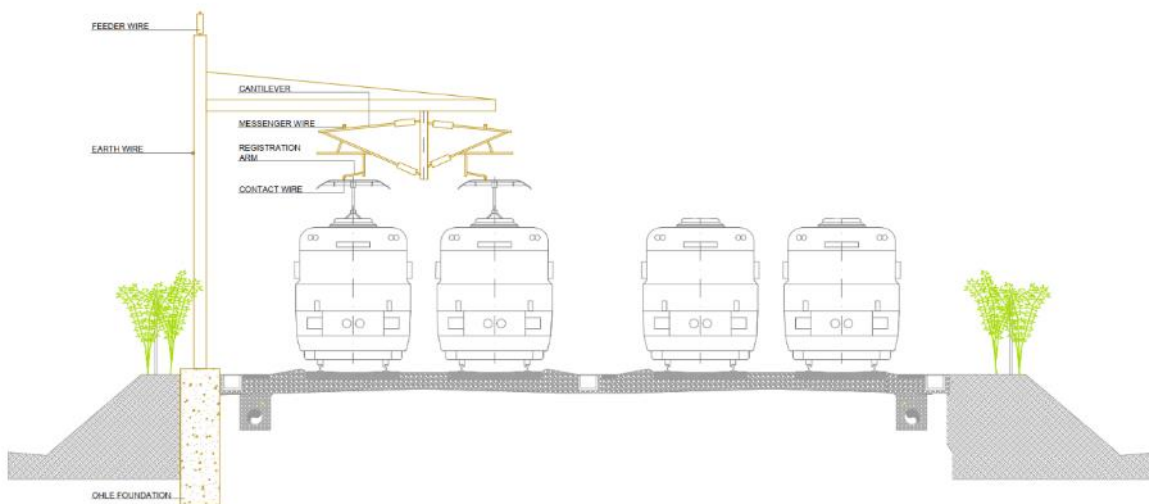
Typical OHLE Arrangement in 4-track Section (Northern Tracks Electrified)
